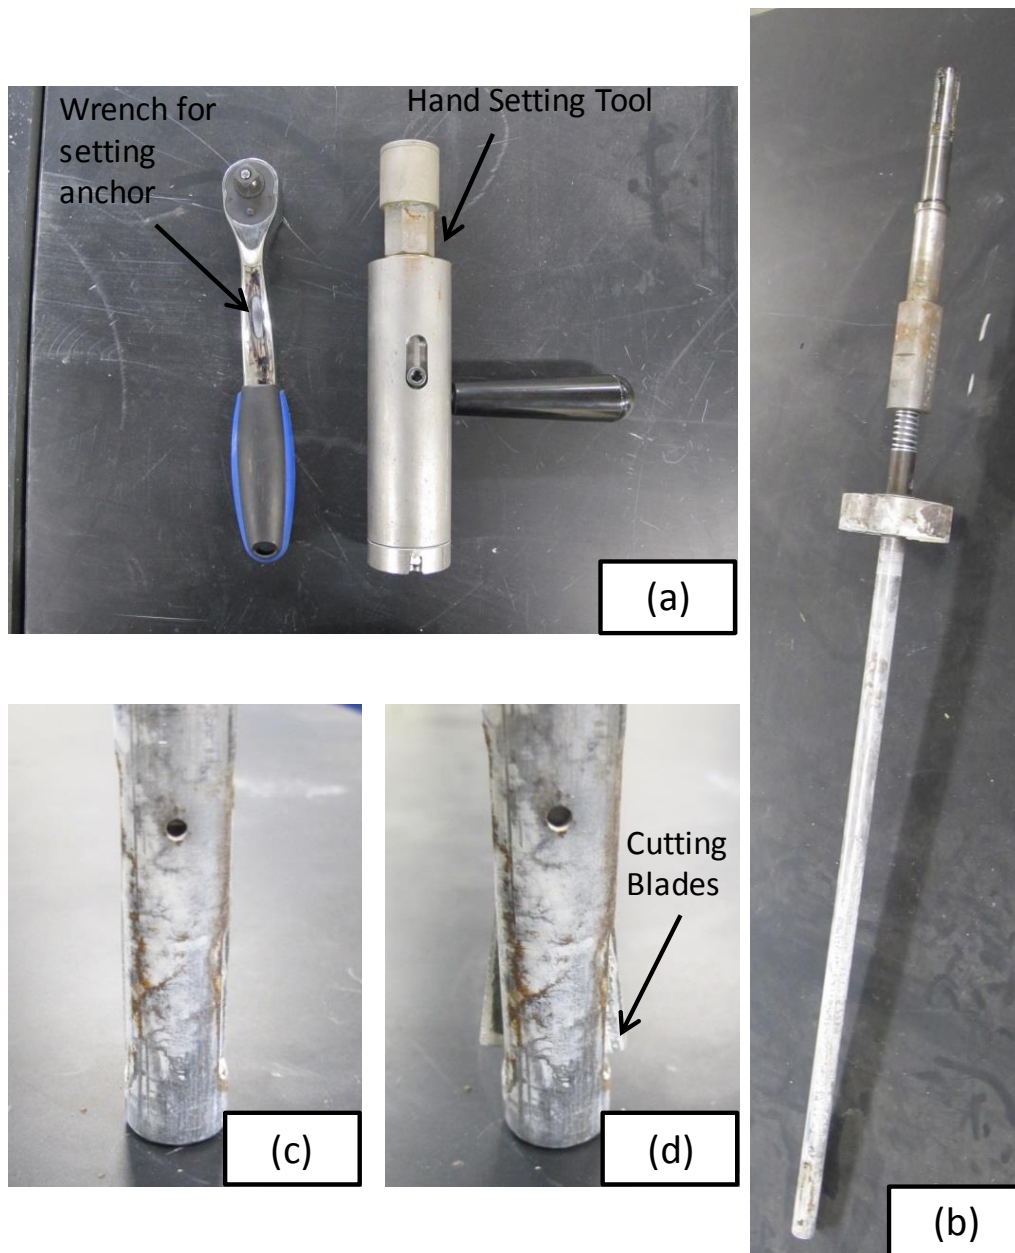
Undercut anchor tooling. (a) setting tools; (b) view of full undercut tool; (c) cutting end of undercut tool, blades not extended; (d) undercutting blades extended.
